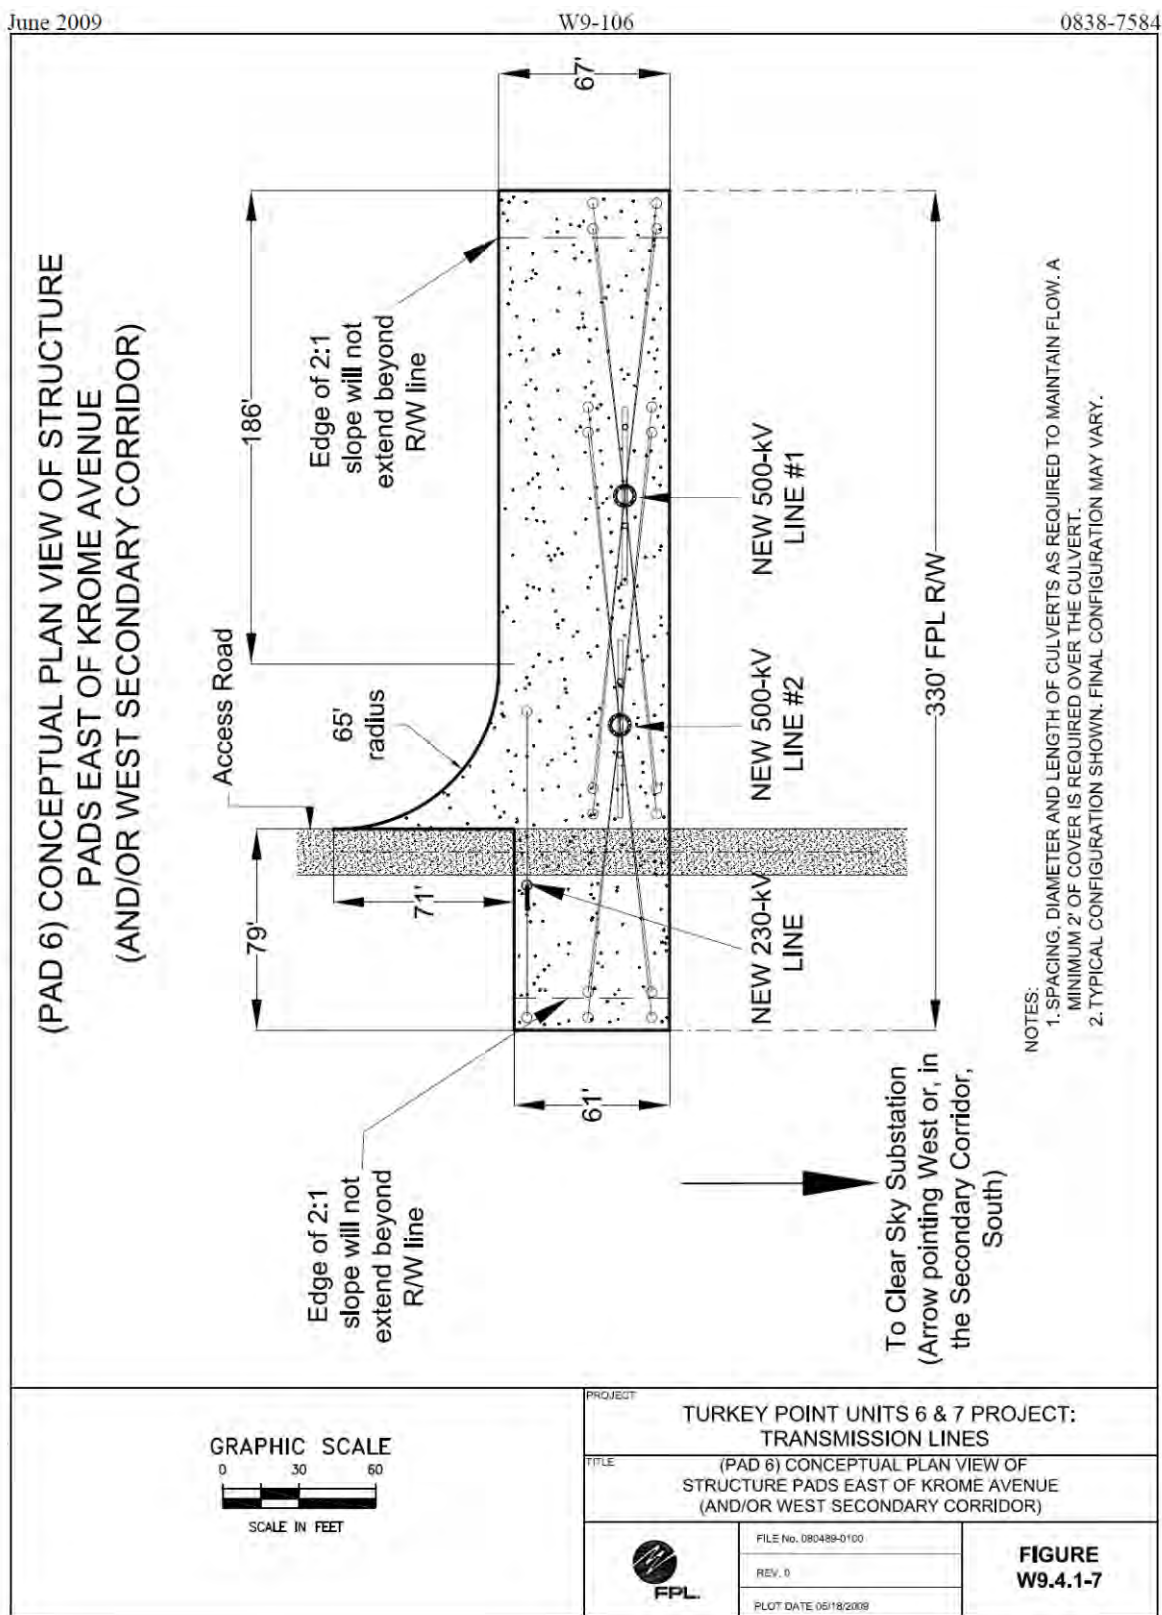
(PAD 6) CONCEPTUAL PLAN VIEW OF STRUCTURE PADS EAST OF KROME AVENUE (AND/OR WEST SECONDARY CORRIDOR)
